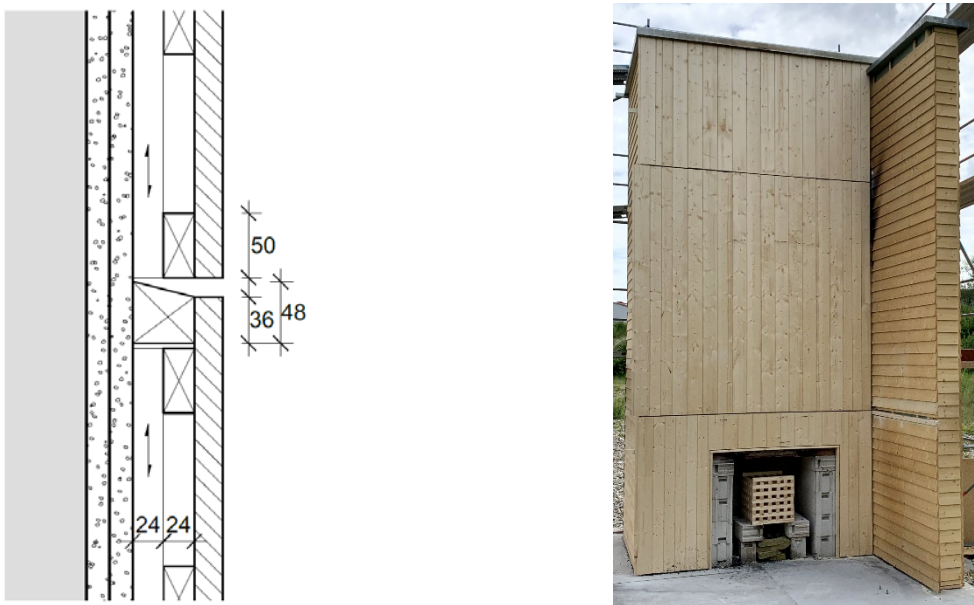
Vertical section and photo of the façade structure in Test 4 [in mm]
